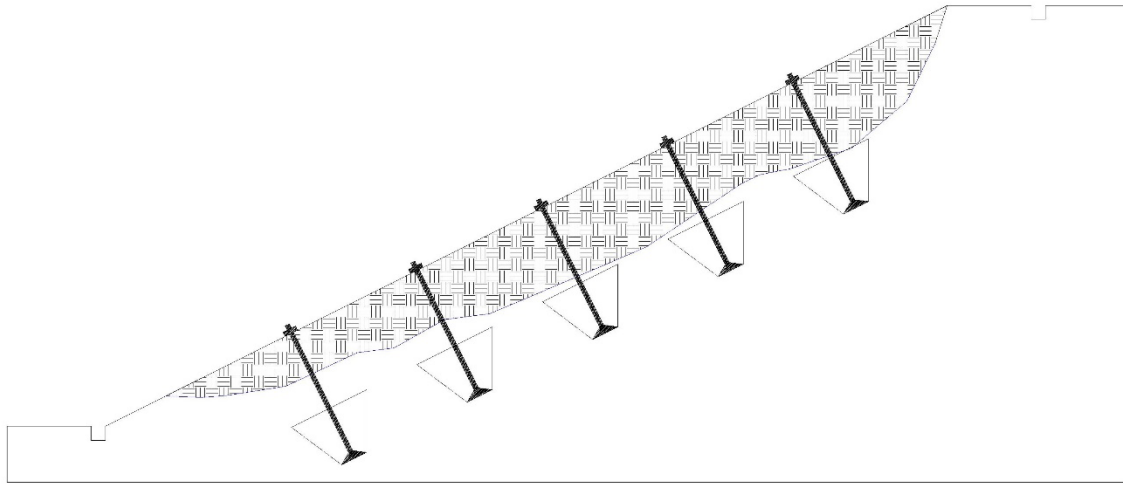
Earth Anchors in slope stabilization (redrawn after Titi and Helwany, 2007)
